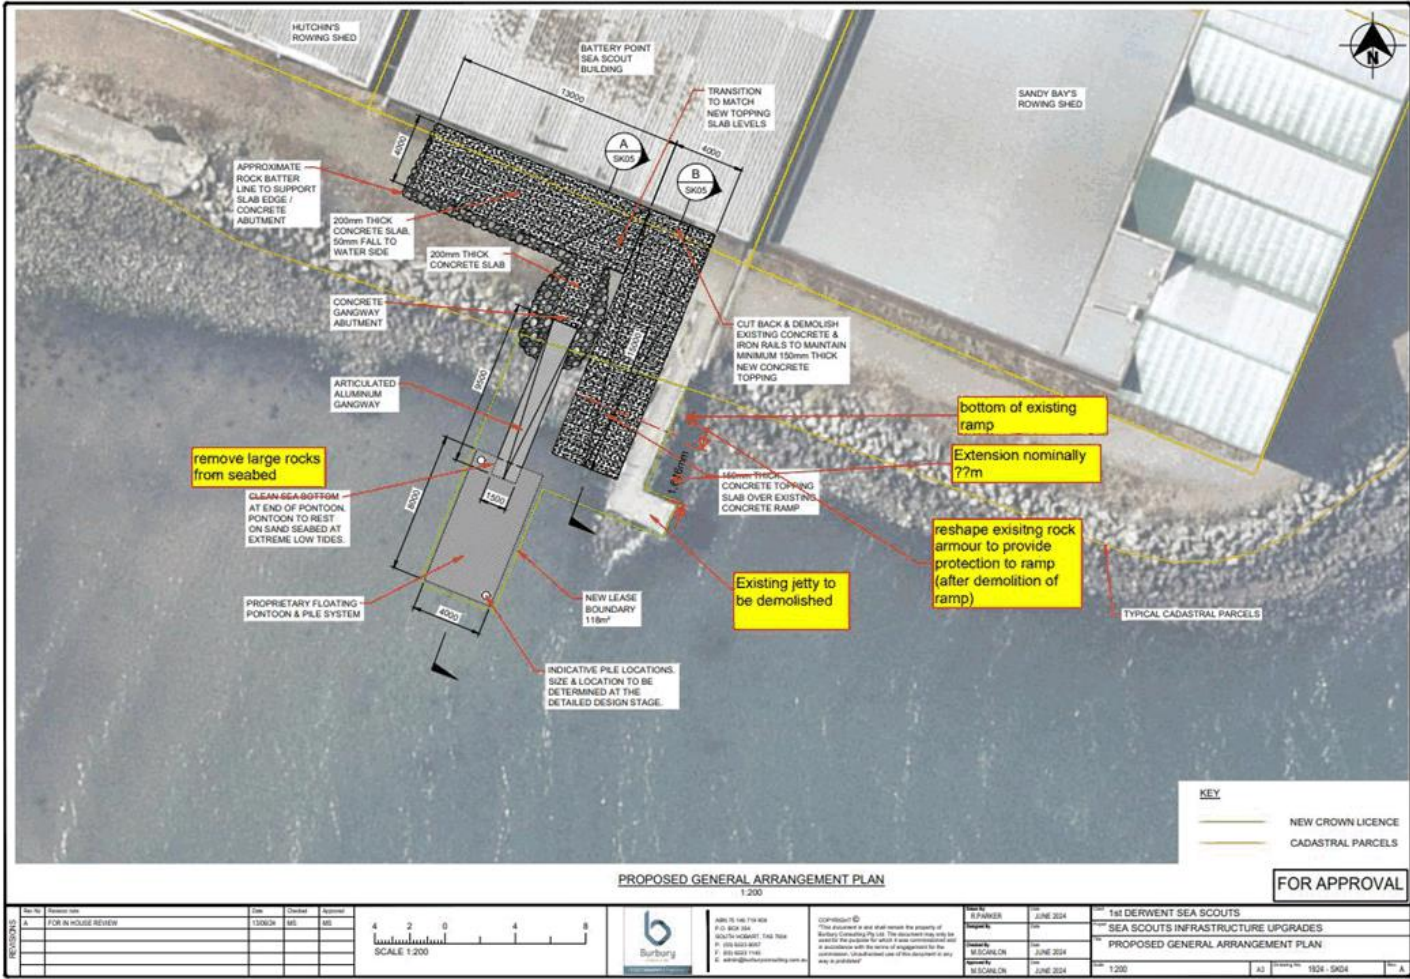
Construction plans for the proposed boat ramp and jetty upgrades, Sandy Bay, Tasmania (image provided by Burbury Consulting).
